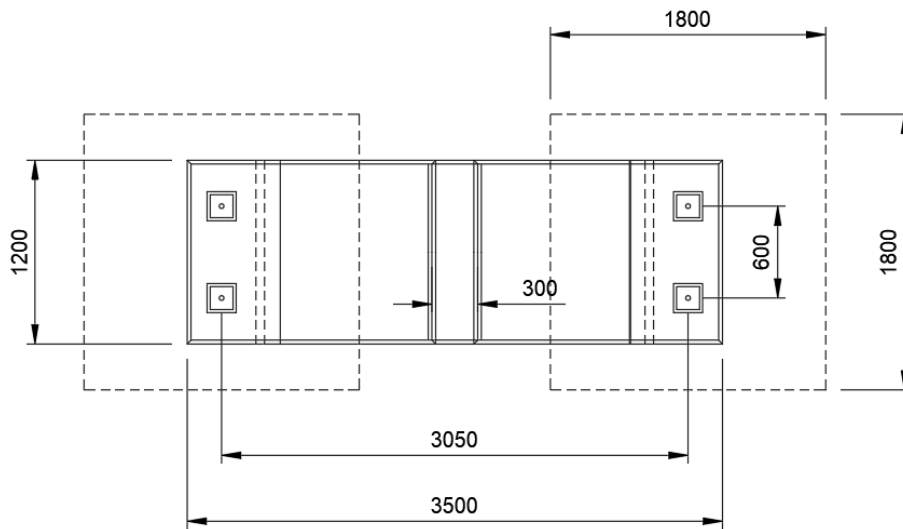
Plan View of PC Element & Mass Concrete Foundations
